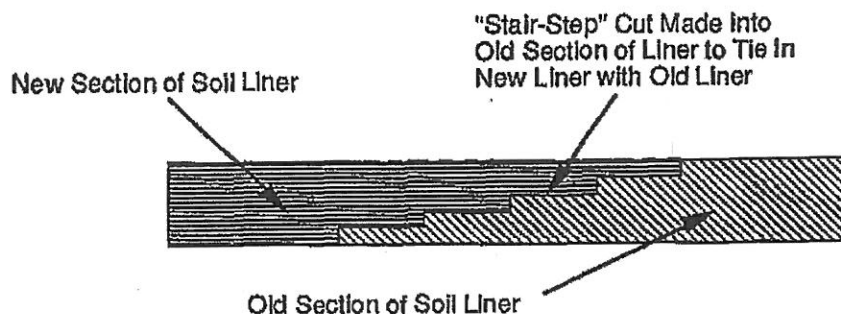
Tie-In of New Soil Liner to Existing Soil Liner
